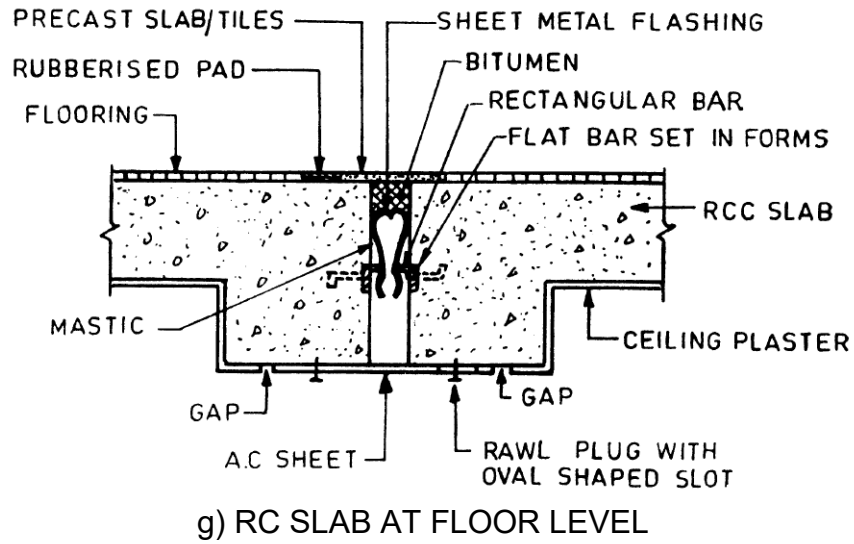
TYPICAL DETAILS OF SEPARATION DEVICES IN JOINTS
